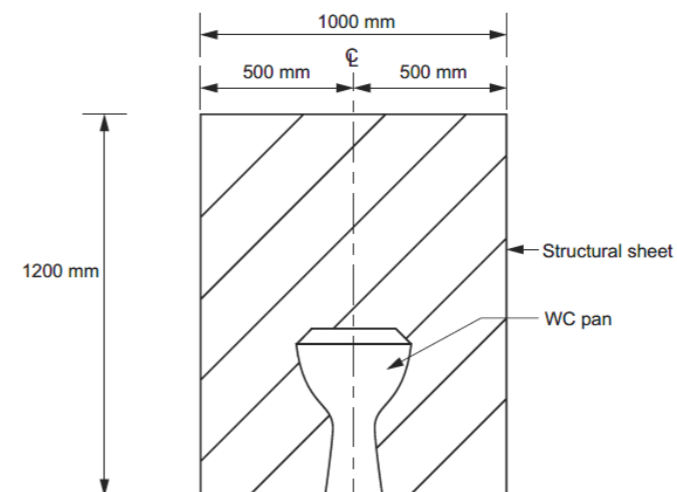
Location of sheeting for a wall behind a toilet pan
